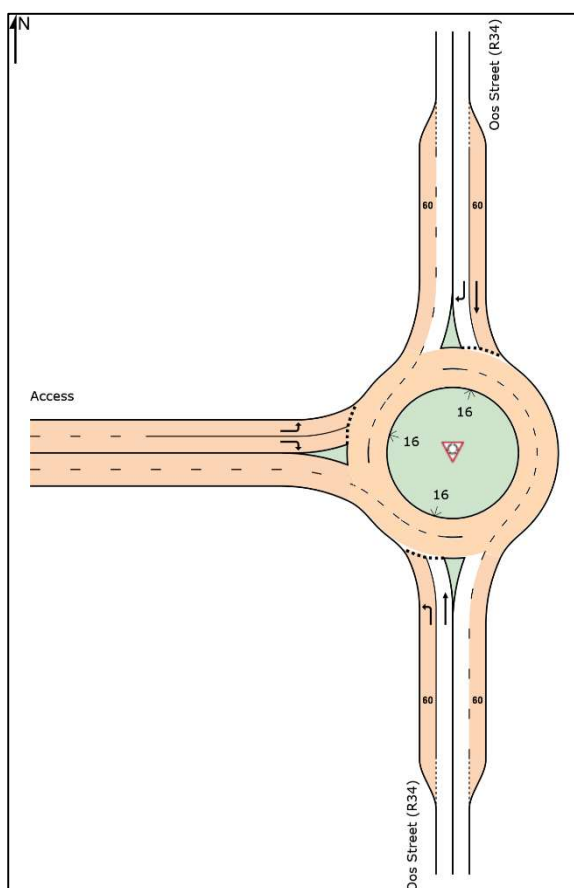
Access off Oos Street (R34) - Proposed Layout
